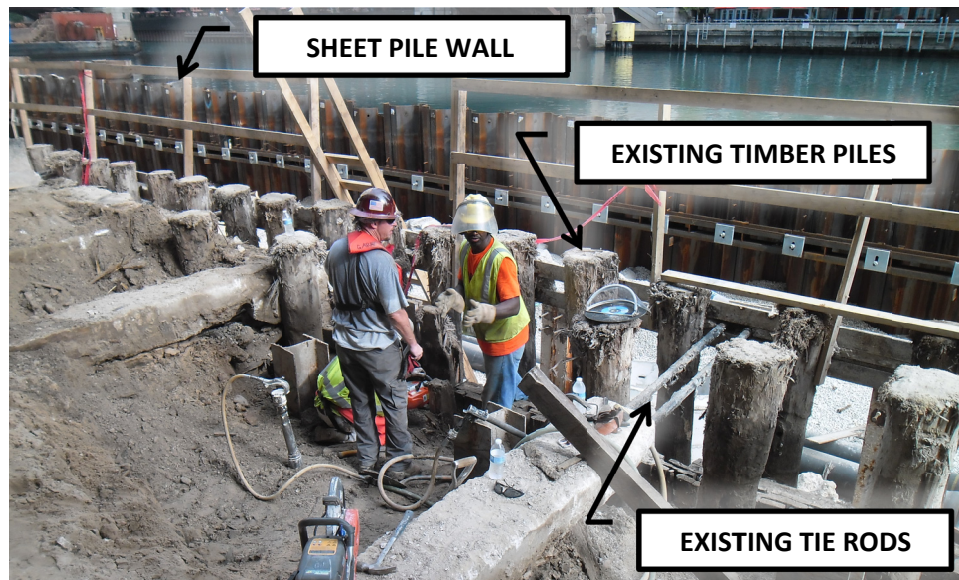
Existing Dock Wall after Removal of Concrete Cap
